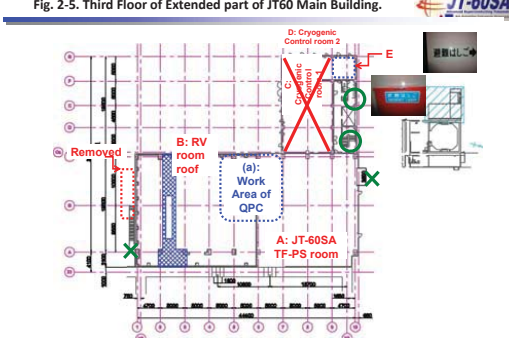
Third Floor of Extended part of JT60 Main Building.
